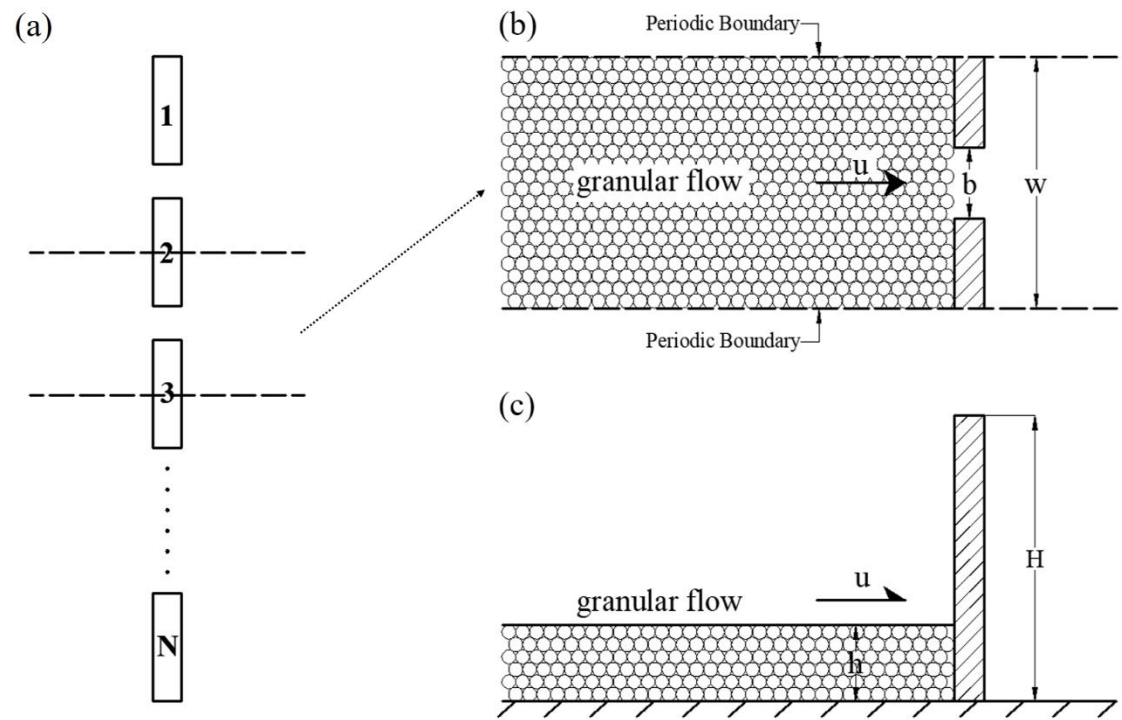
Numerical model: (a) a chosen section of slit-dam; (b) plan view of the chosen section; (c) side view of the chosen section
